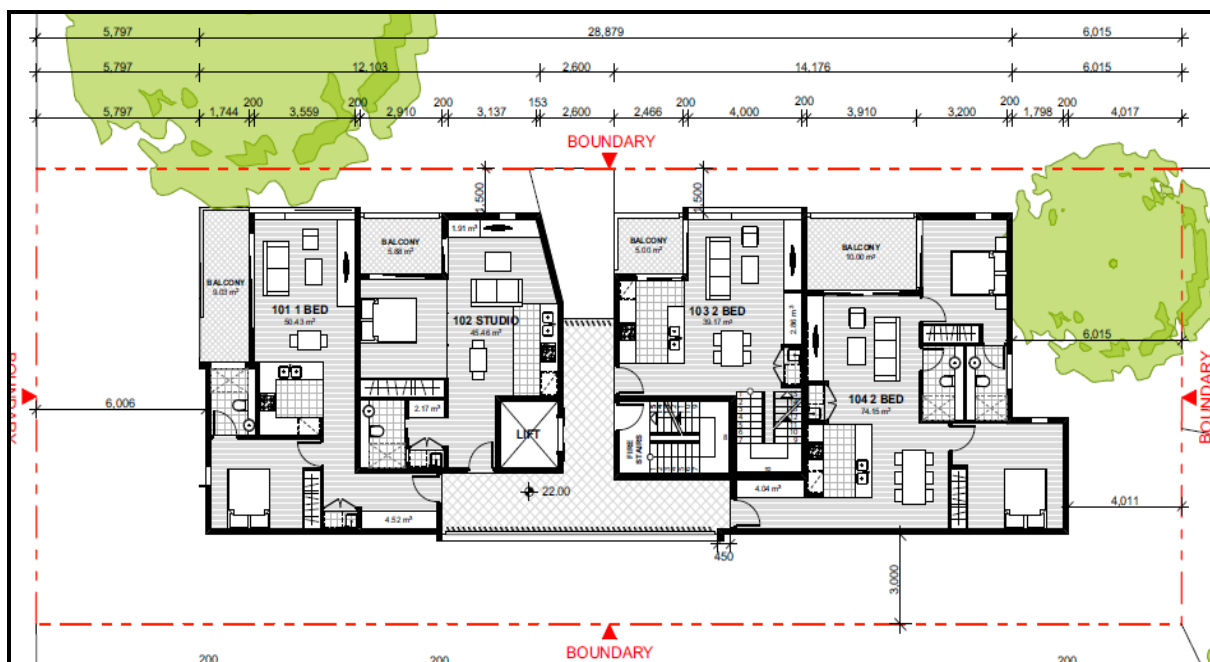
186 Moore Street 2<sup>nd</sup> floor plan (proposal RFB to the east)
